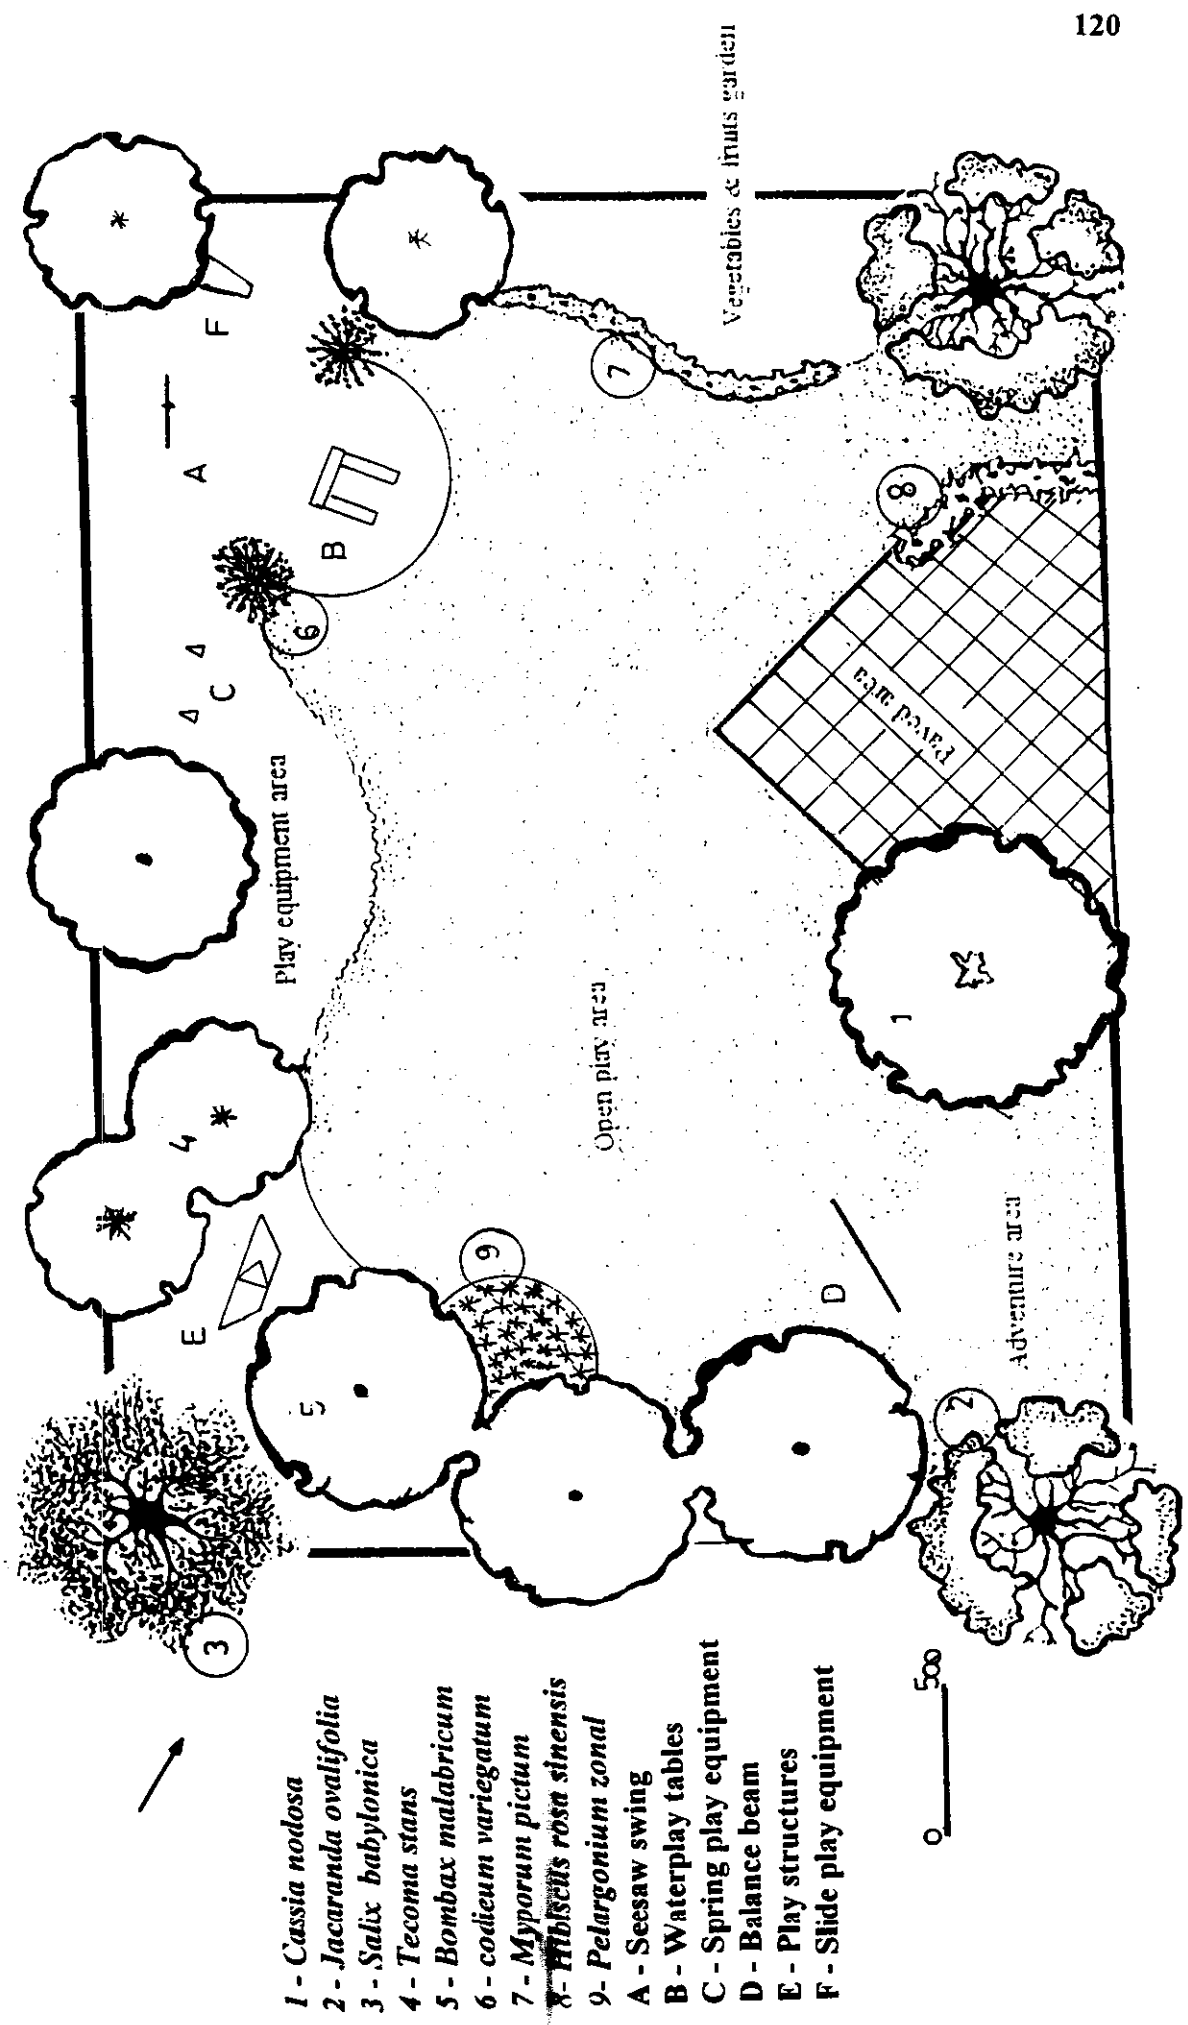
A proposed design for kindergarten garden in an area 600 m .
